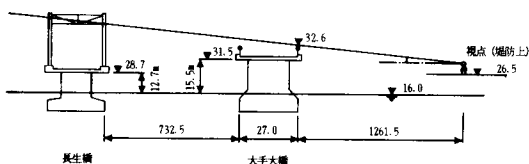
Double silhouette of Chosei bridge and Ote bridge
